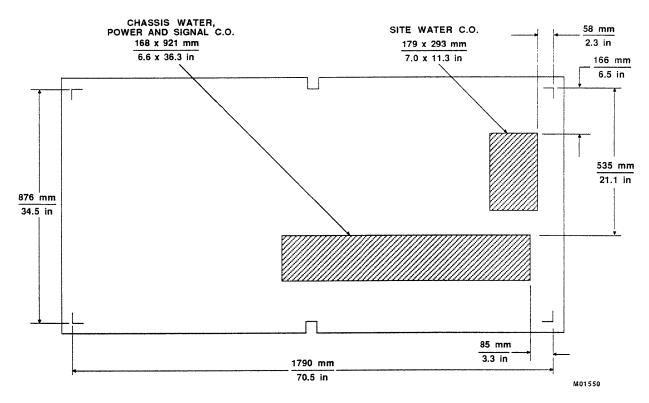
18675-1/3 Water Cooling Unit Floor Cutouts
